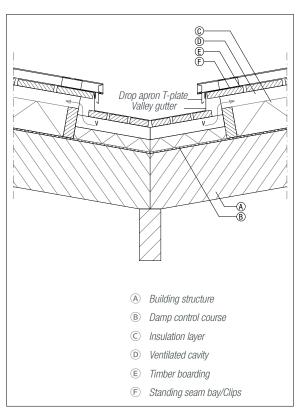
Valley gutter detail roof pitch $< 15^{\circ}$
